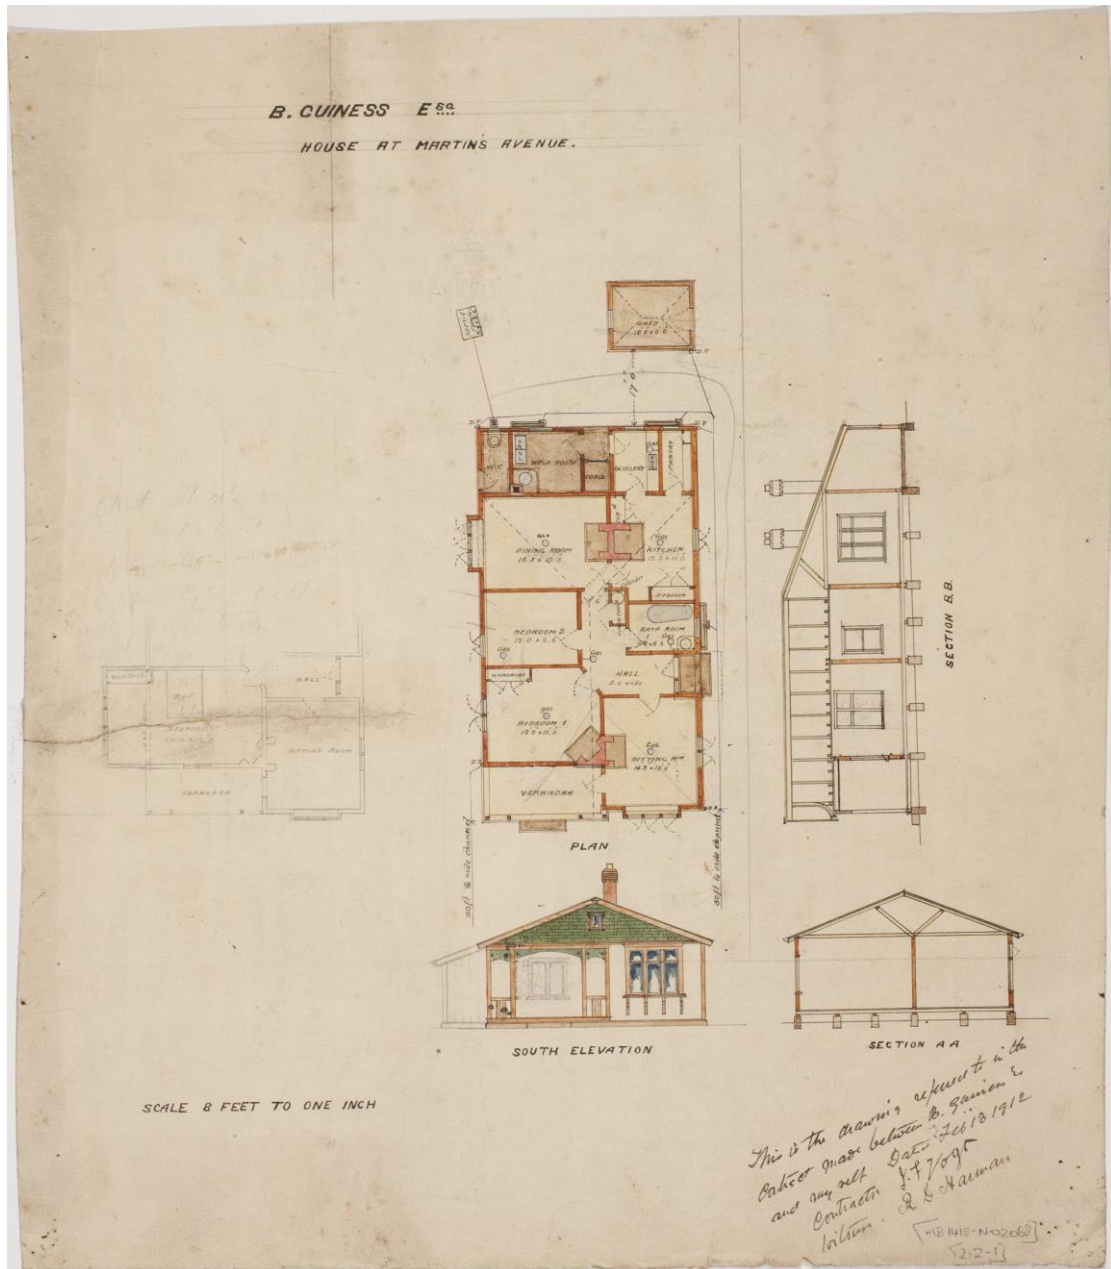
Collins and Harman, B. Guinness, Esq., House at Martin's Avenue, plans, elevation and sections (1912).
